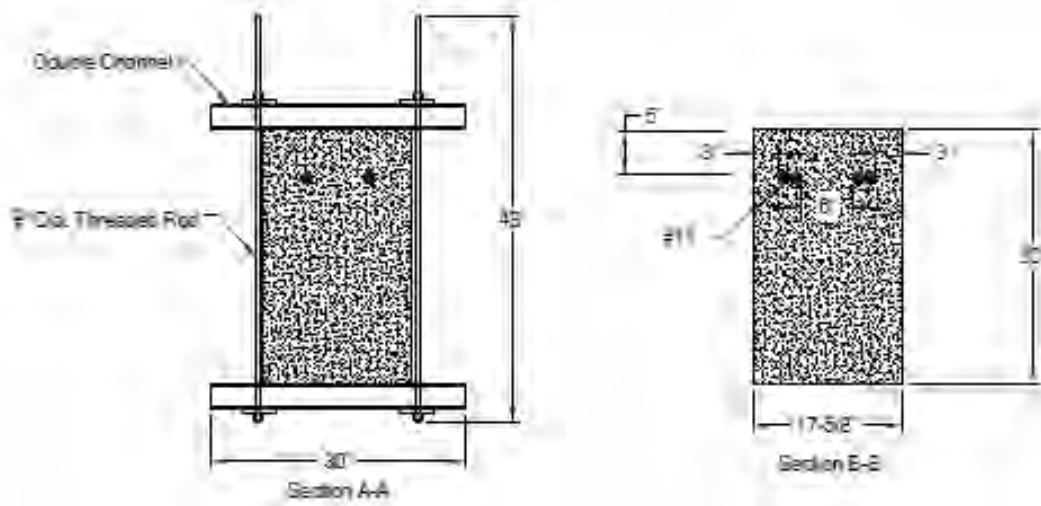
Cross-Sectional Dimensions of Series A and B Girders
